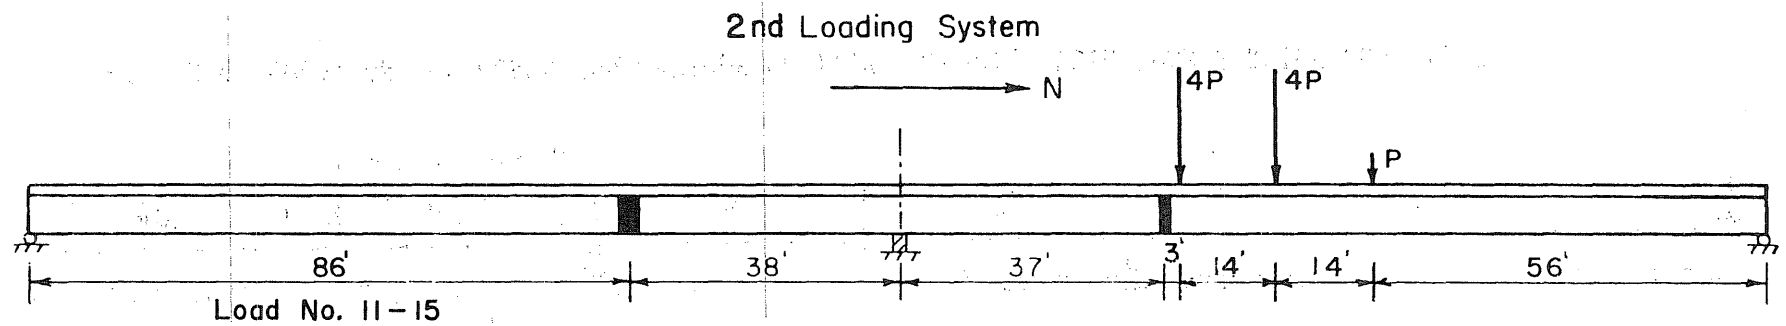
LOCATIONS OF LOADS FOR MAXIMUM SPLICE SHEAR, NORTH SPAN SERVICE LOAD TEST
